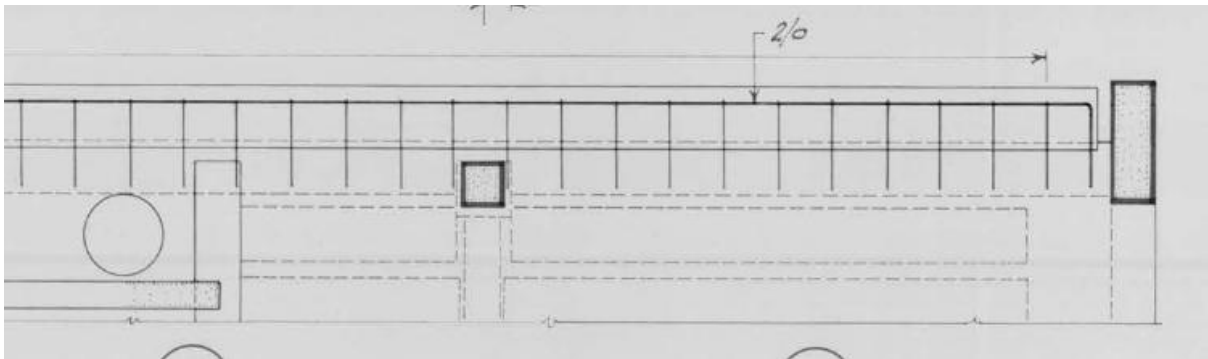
Plan on Slab Edge Denoting Peripheral Ties
